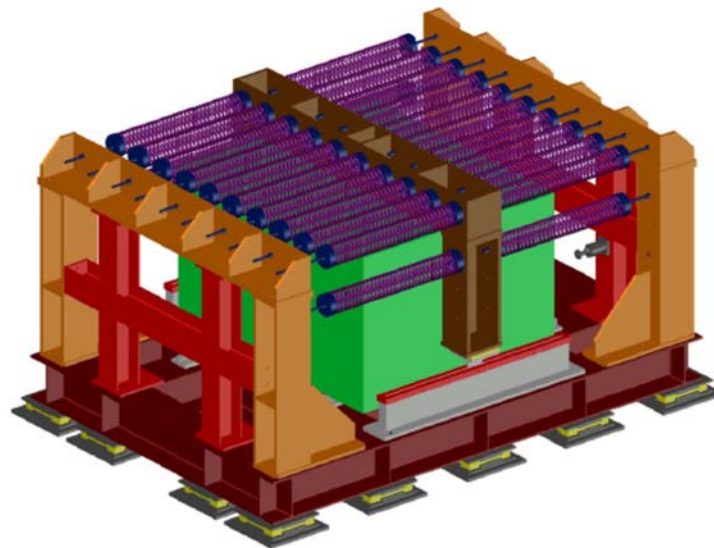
50-ton Sliding-Type Tuned Mass Damper to be installed on top of the roof (Gradient Wind Engineering Inc.)
